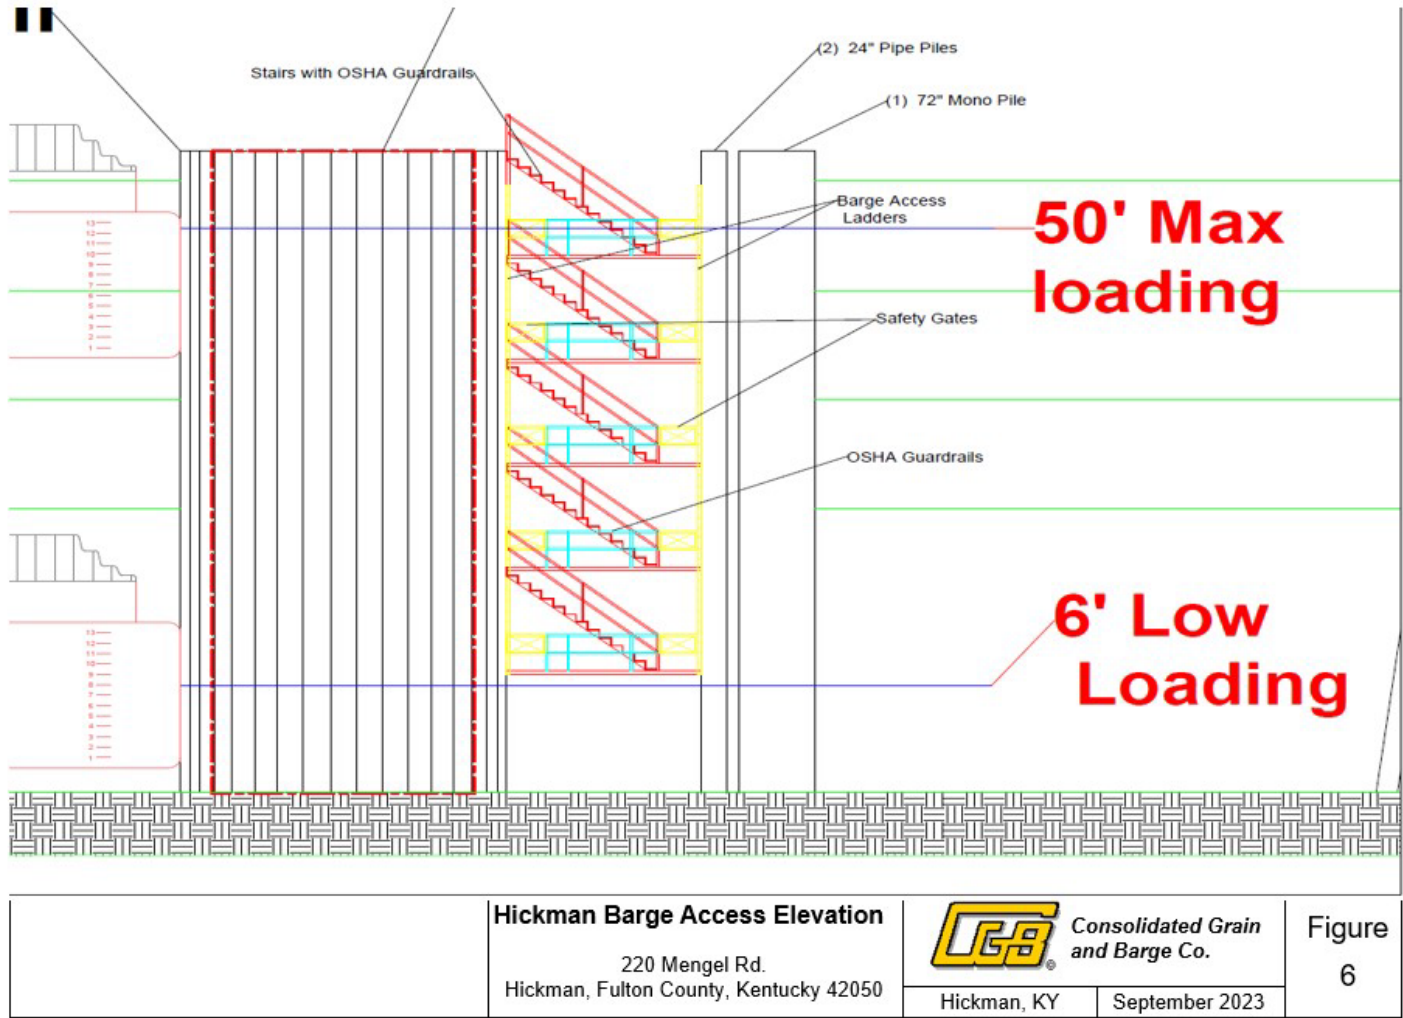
Proposed Section 408 project features, Consolidated Grain and Barge, Hickman, KY showing proposed barge access.
